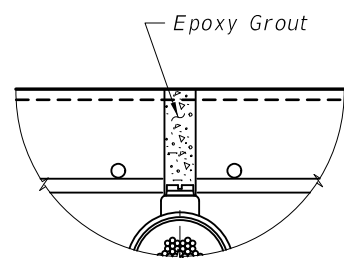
DETAIL A - FACE INSPECTED ANCHOR WITH GROUT OUTLET
